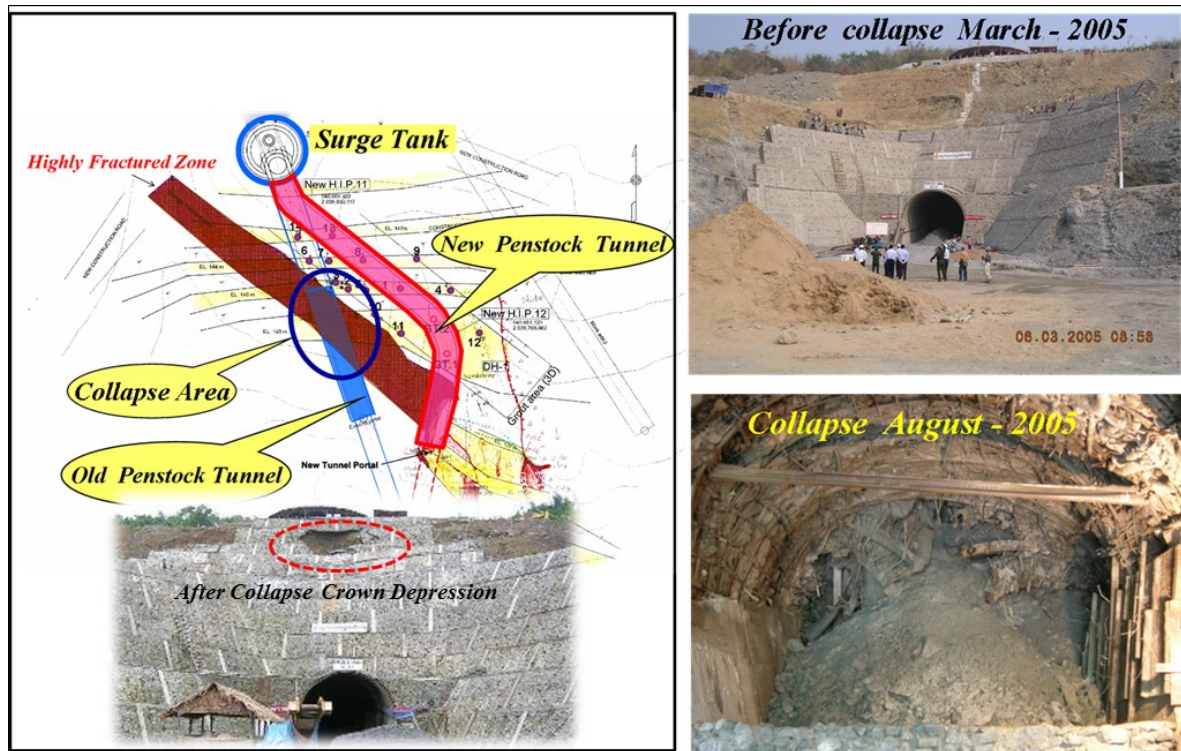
Tunnel Face Failure at Sheared Mudstone Zone
